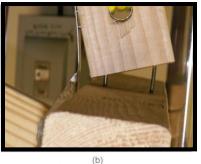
Failure of reinforced configuration occurred when nail farthest from tie pulled out of stud
